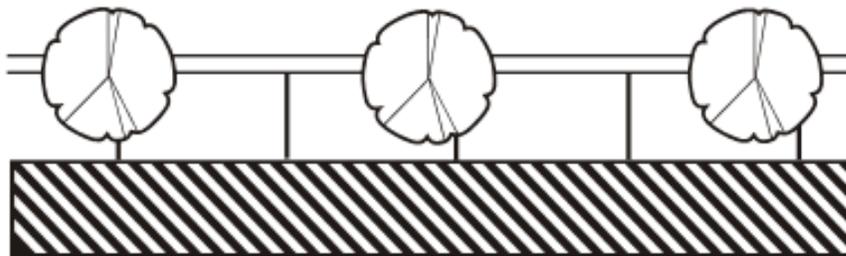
Narrow Boulevard Columnar Tree Awning Plan
